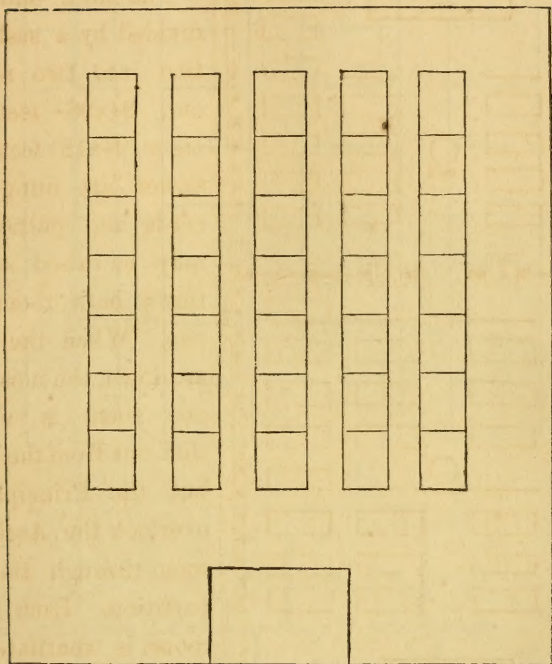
is a frame house, $24\frac{1}{2}$ x46 feet from outside to outside, and 14 feet high to the square, with an arched ceiling.
